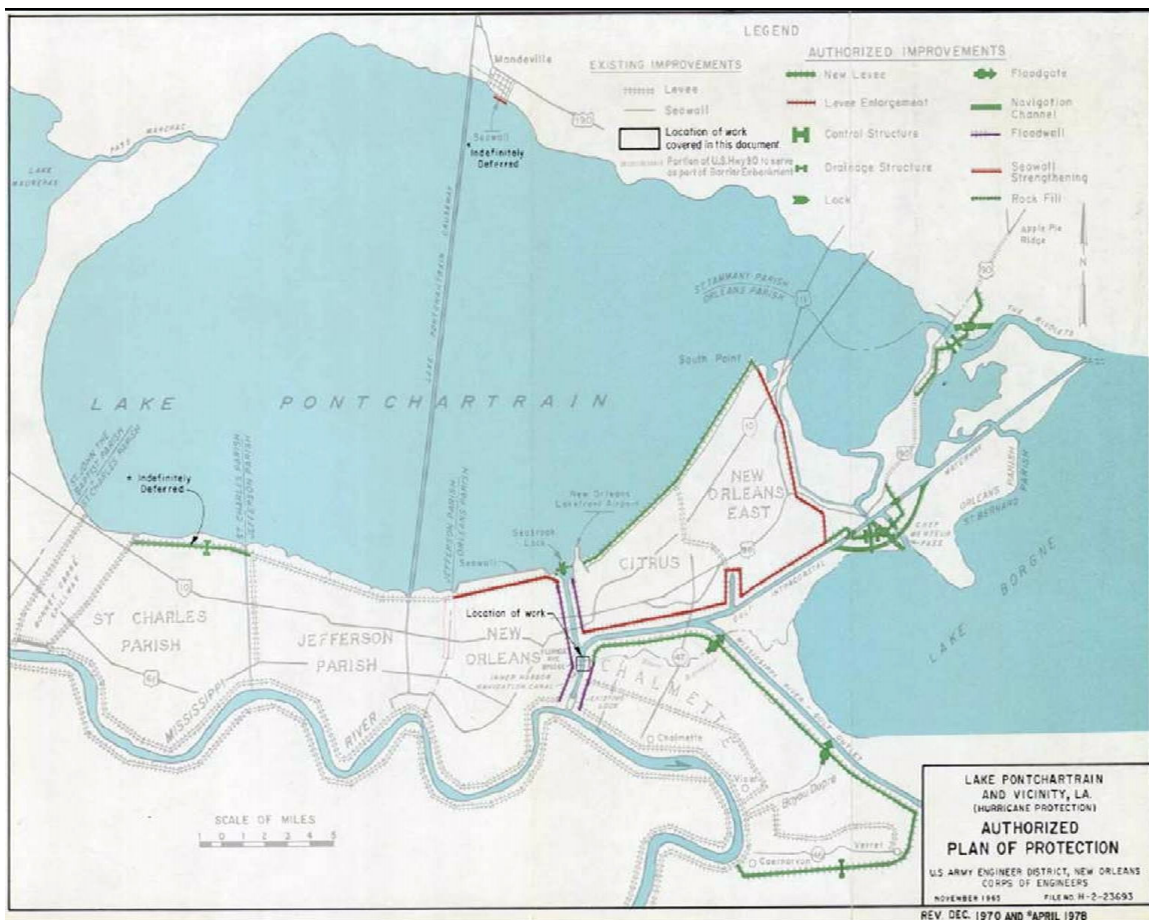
U.S. Army Corps of Engineers Authorized Plan of Protection, 1970.
